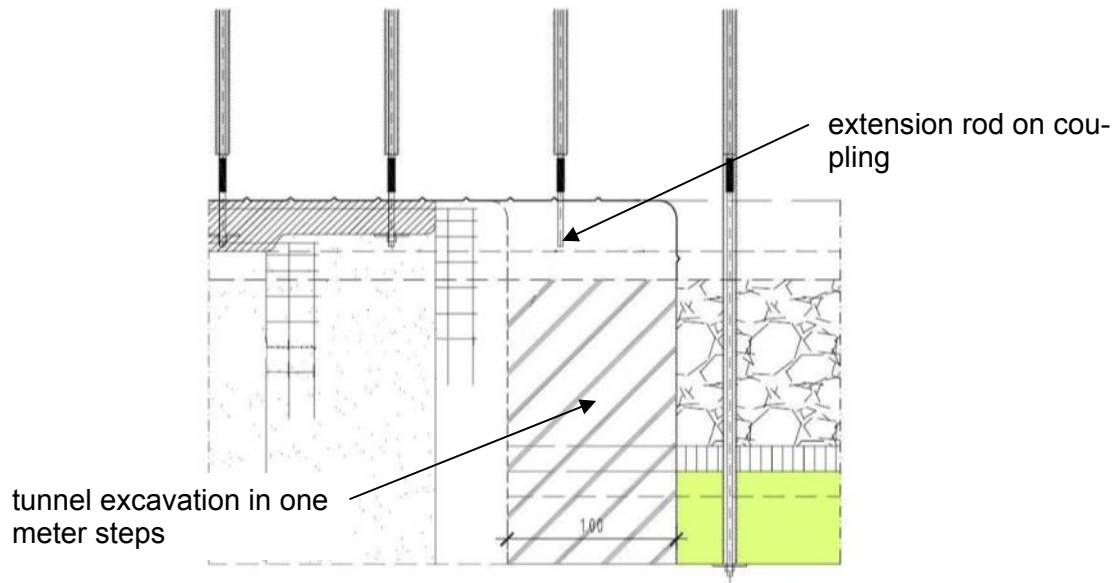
, tunnel enlargement – Phase 2, tunnel cross section (source Beton- und Monierbau)
